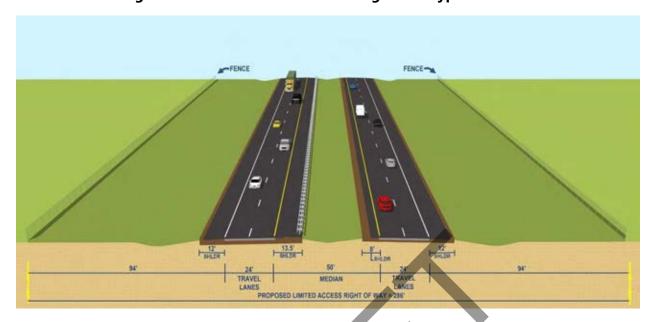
Alternative 2: New Alignment Typical Section
